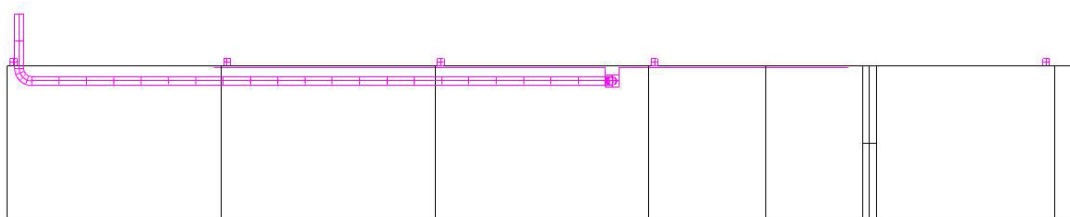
Side View of the Air System in the Pump Room and Tank 11
